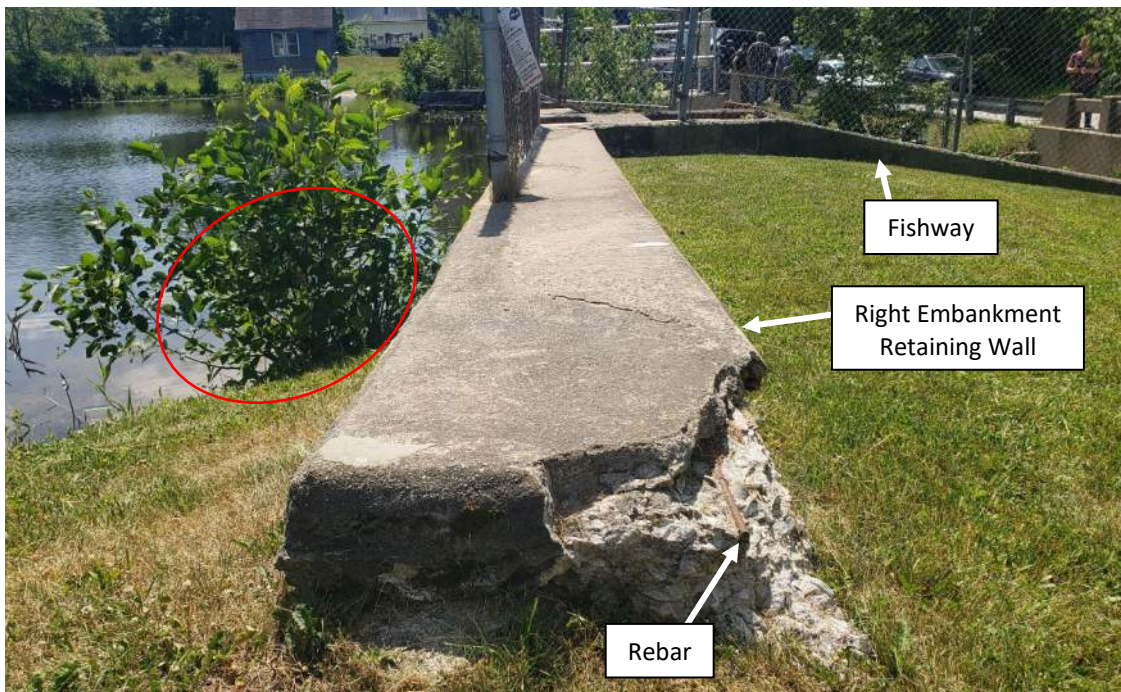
View from right abutment, looking left. Note upstream vegetation and concrete loss.
